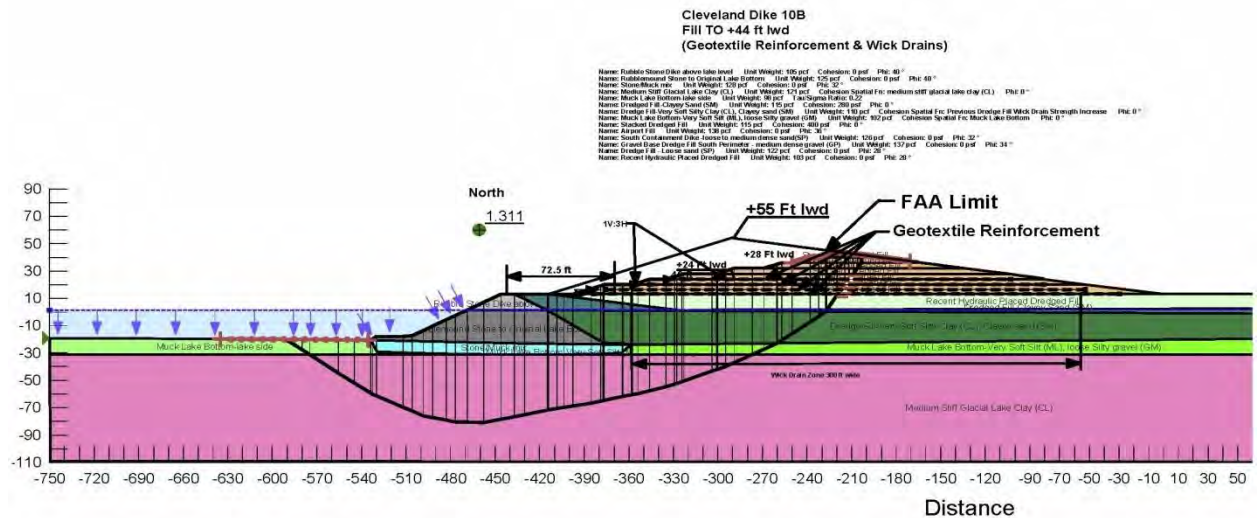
CDF 10B Option 4, Geotextile Reinforcement Stability Section
